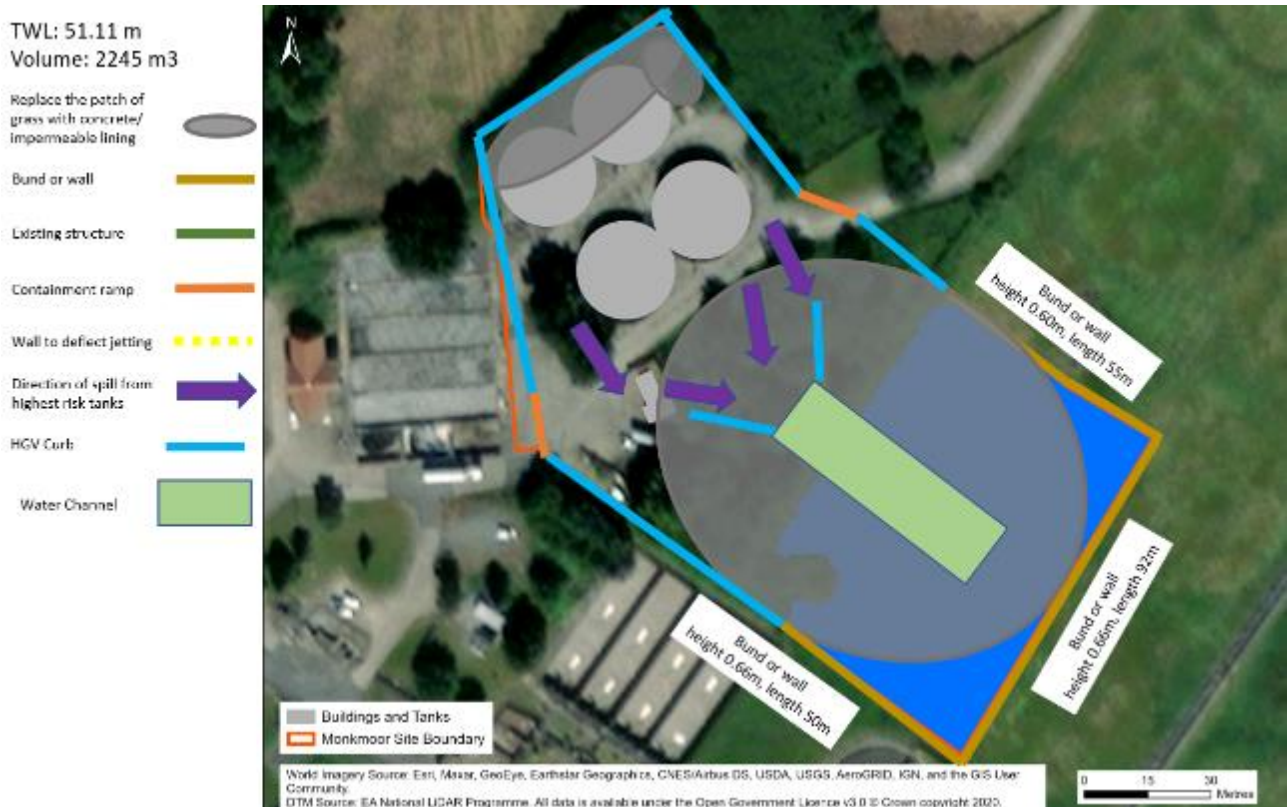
recommended modifications to provide remote secondary containment for area 2
